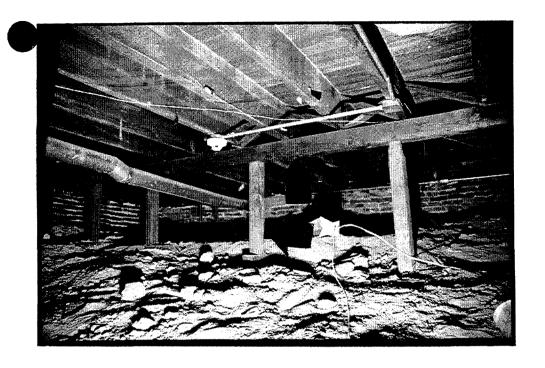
FIRST FLOOR JOISTS AT THE 1874/1879 ADDI-TION
